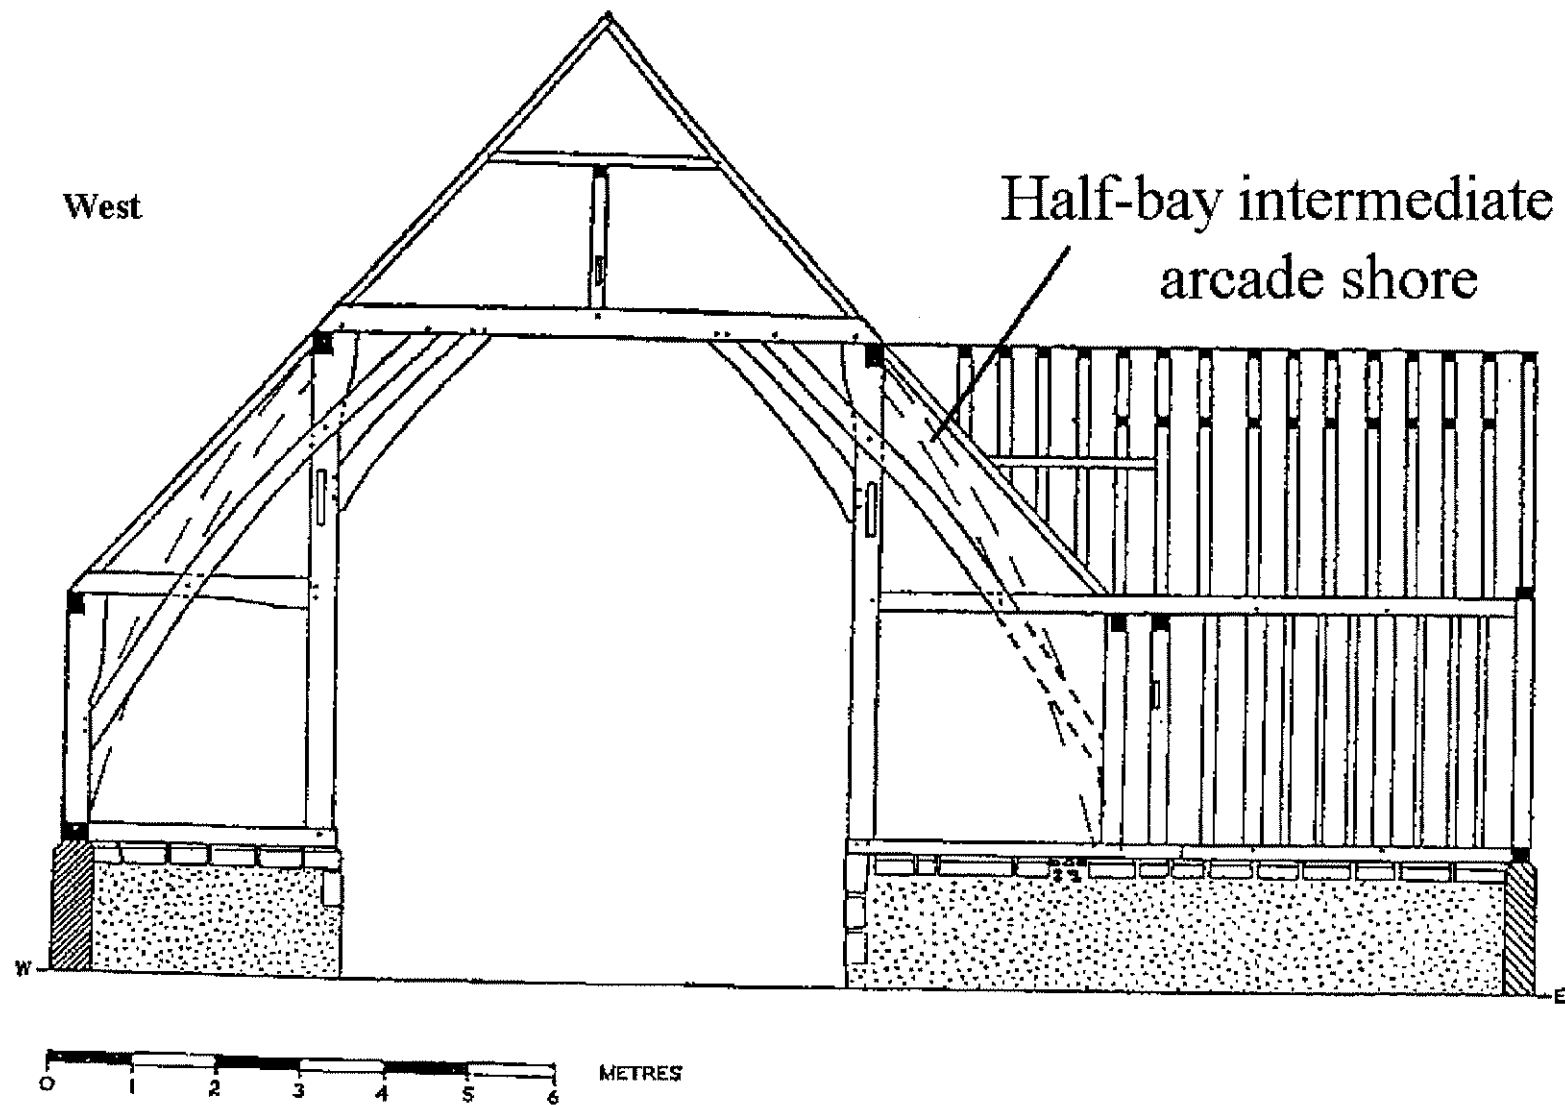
Cross-section of Croxley Hall Farm Barn showing truss form and position of the intermediate arcade shore (dashed lines)
